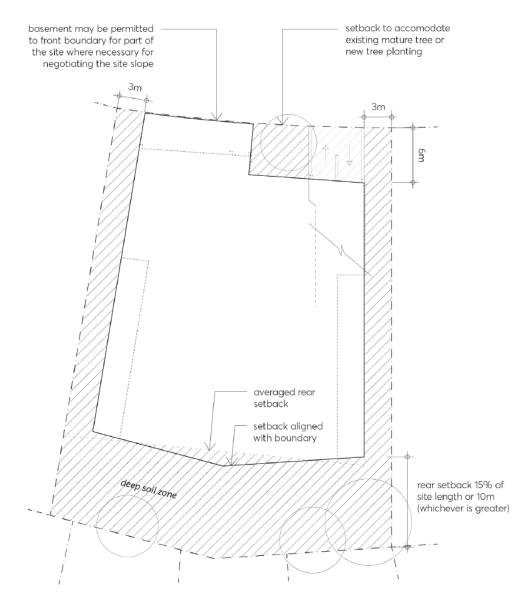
Indicative Basement and Deep Soil Plan
